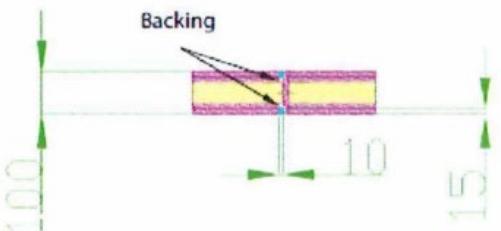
wall gypsum to stone thickness  $\geq 100$  mm
